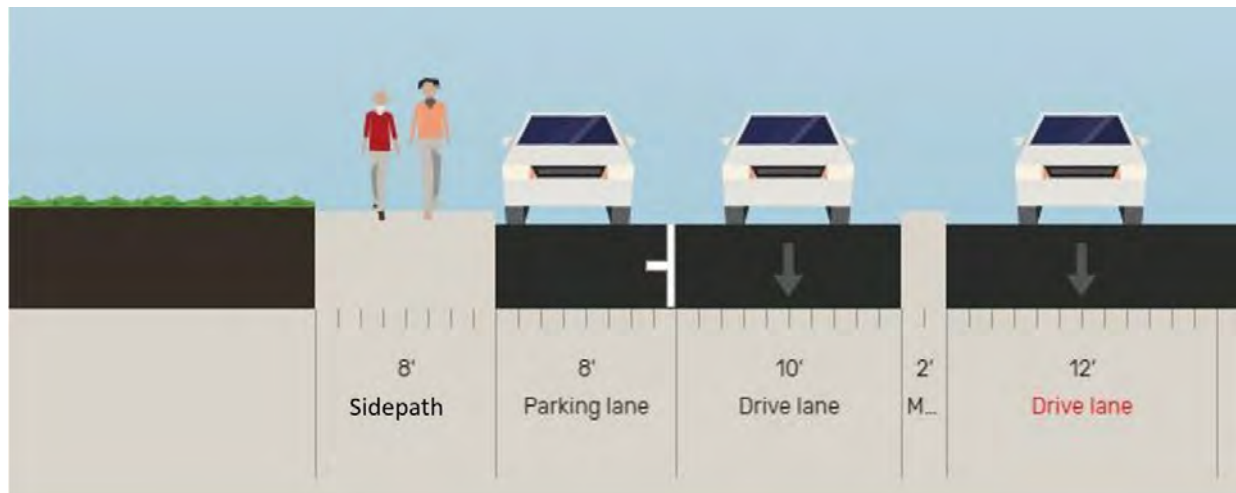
New Avenue Bikeway between Belford Place and Shopping Center Signal – Option 2
